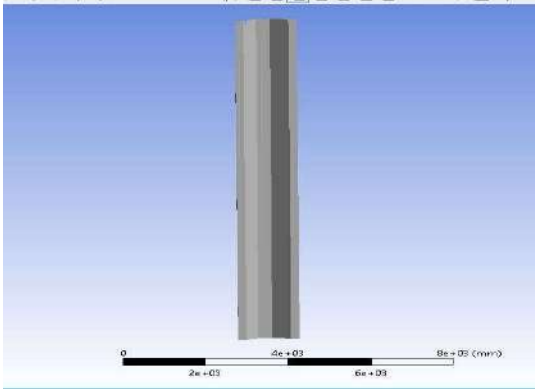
Geometry of sheet pile without pitting corrosion
